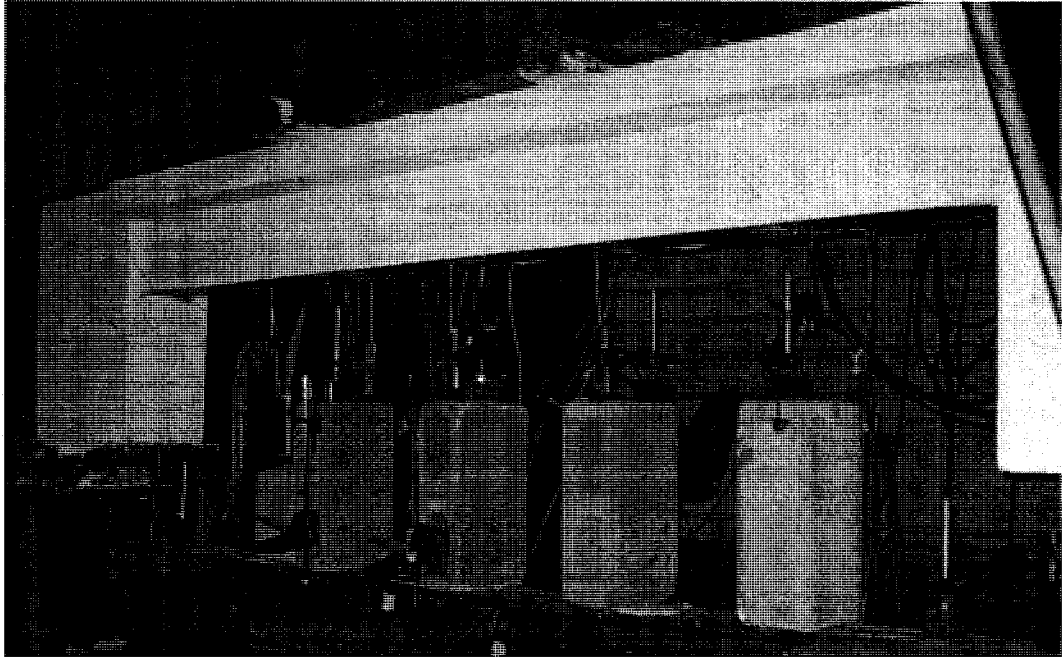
Beam F-E-B (strengthened using one layer of epoxy-bonded CFRP sheet) before test
